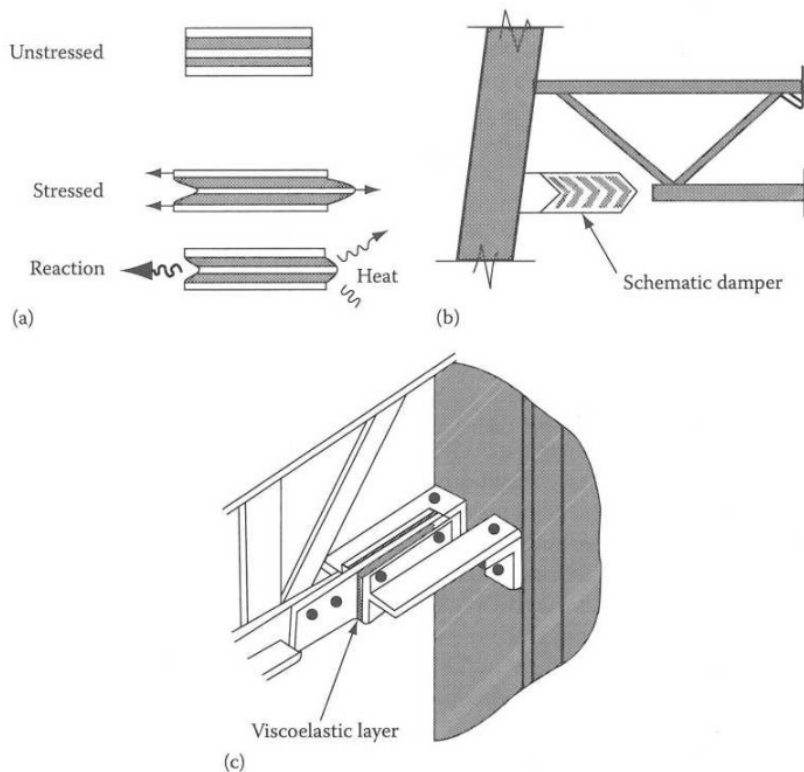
Arrangement of viscous dampers in the WTC twin towers [24]
